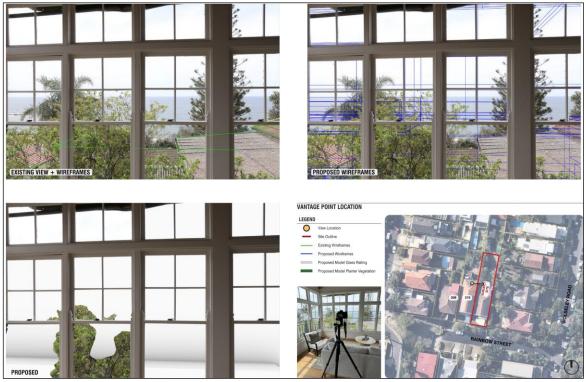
Montage provided demonstrating the expected impact on 310 Rainbow Street from the Dining room (Source: AE Design)
